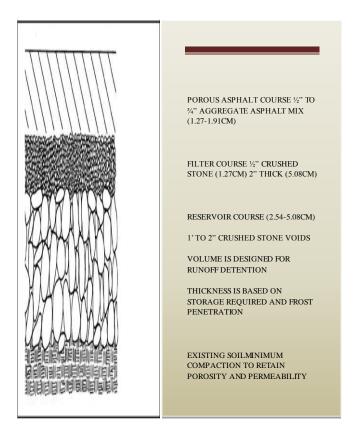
Porous Asphalt Paving Typical Section [Diniz 1980]
